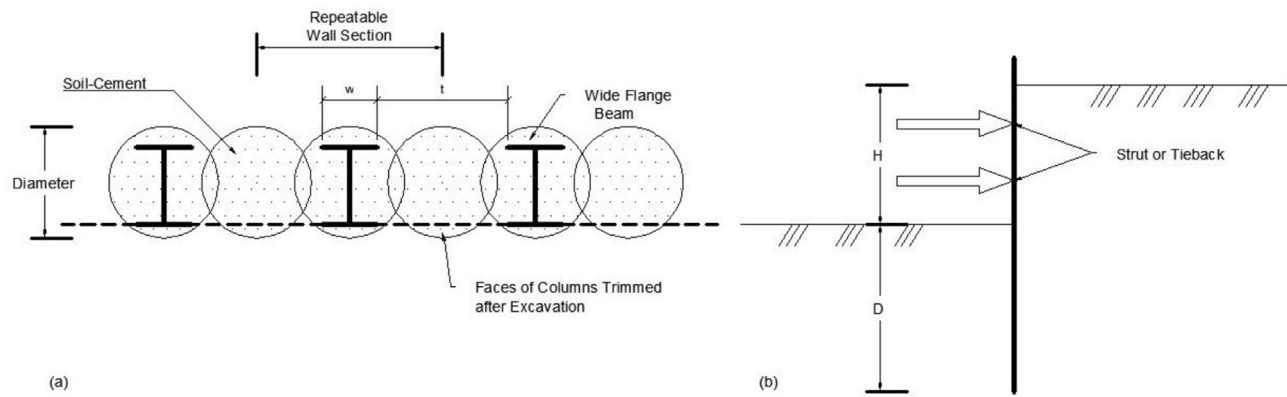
Typical design diagram for DSMW: (a) Plan view, and (b) Section view.
